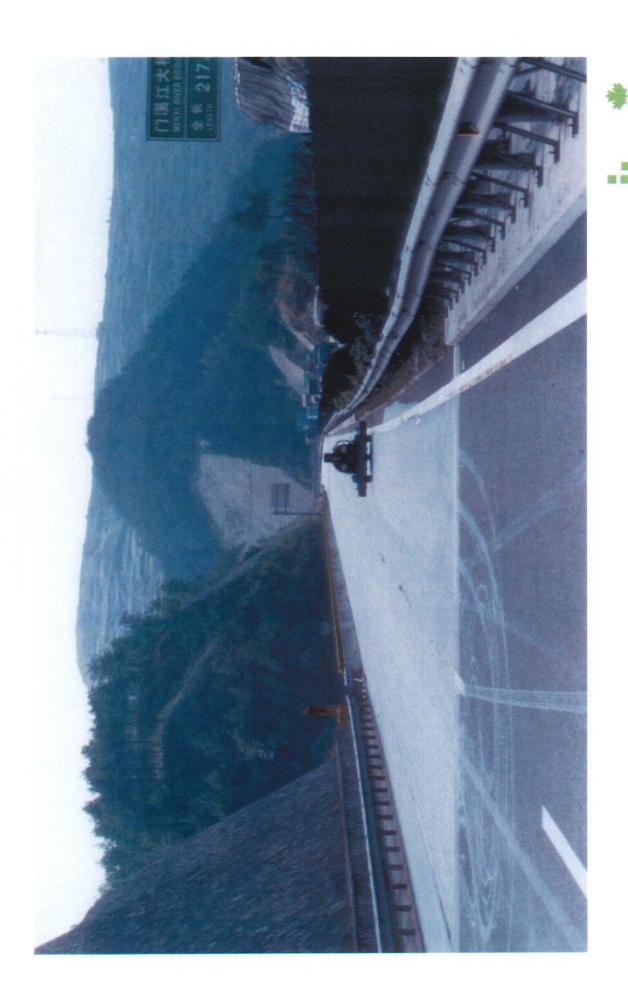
Finished Surface Northbound Bridge Deck - Km 90
